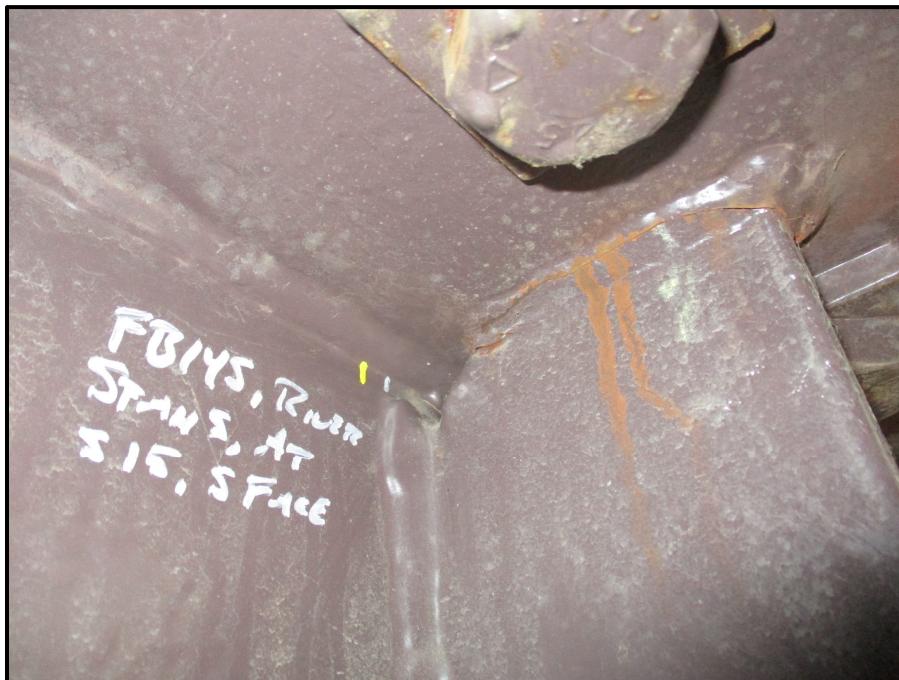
River Span-S, Floorbeam 14S at Stringer 15S - Previously noted distressed paint along the south face of the upper web has now developed into a 1-1/2" L crack, looking northeast. Note the completely severed stiffener top weld (previously noted condition).
